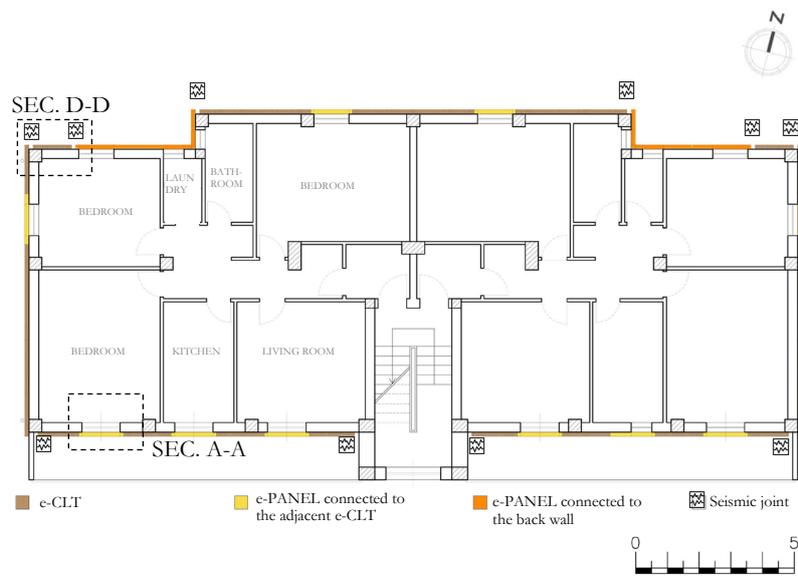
Ground floor plan of the case study after the application of e-CLTs and e-PANELs.
